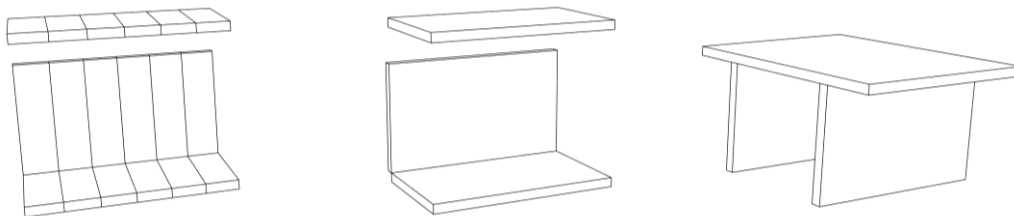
Manufacturing a timber floor (Lawson et al., 2014)
